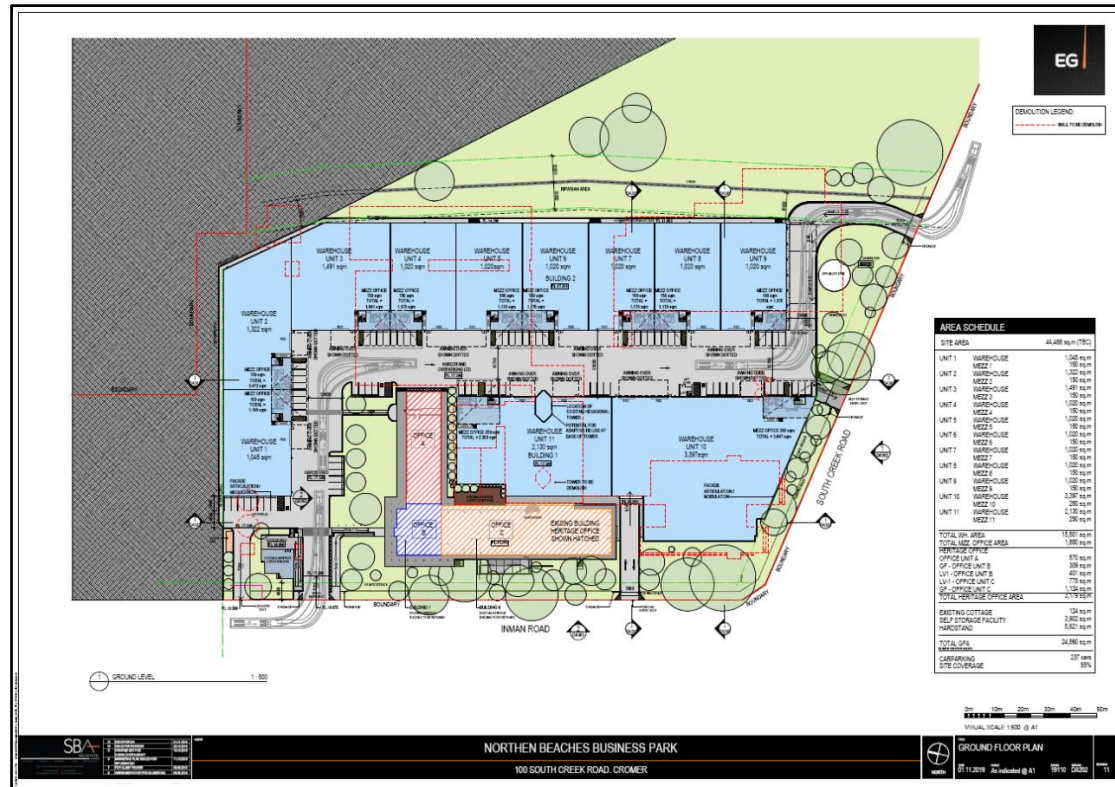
Proposed Industrial Development, Ground Floor Plan.
